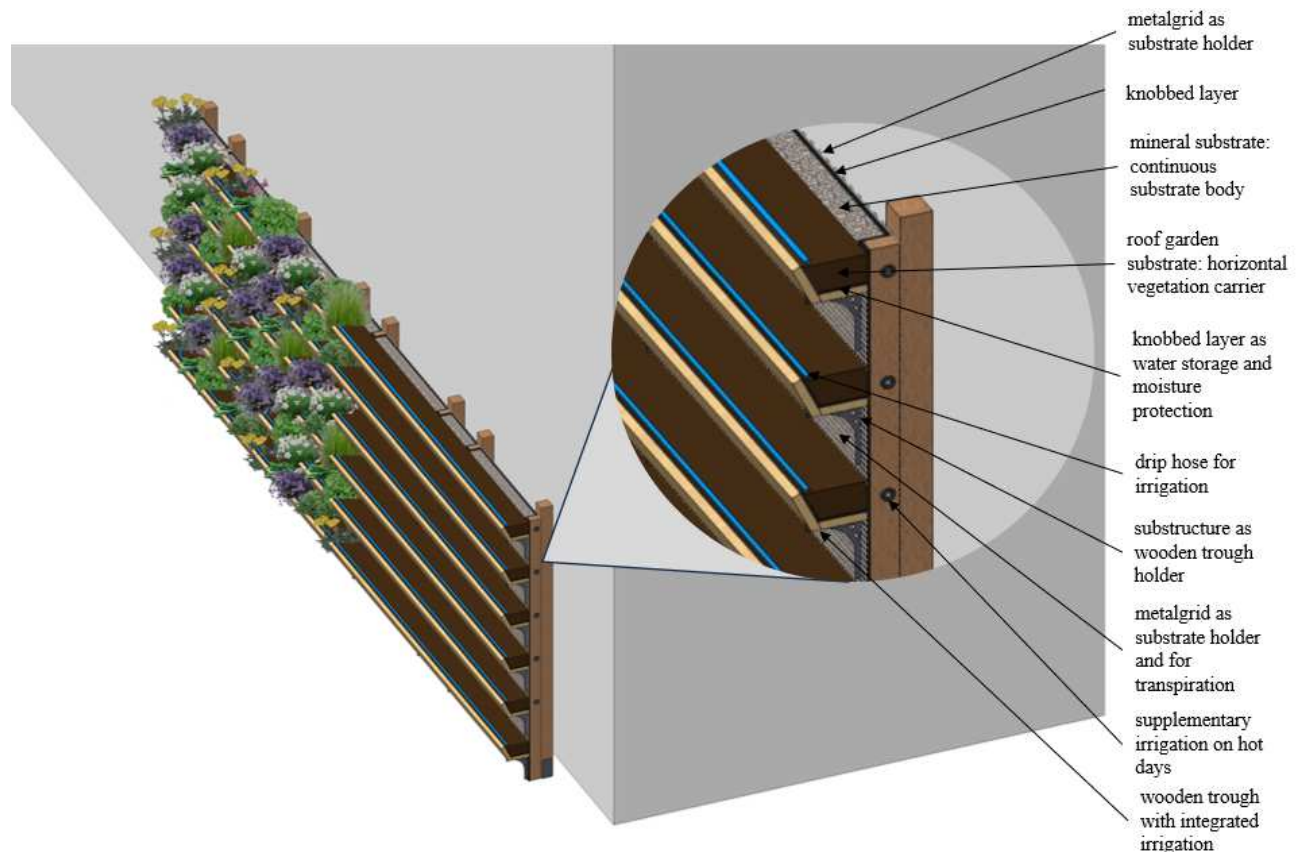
Illustration of the EVAPO+ transpiring green wall on the roof terrace of the Strasshof municipal office building
